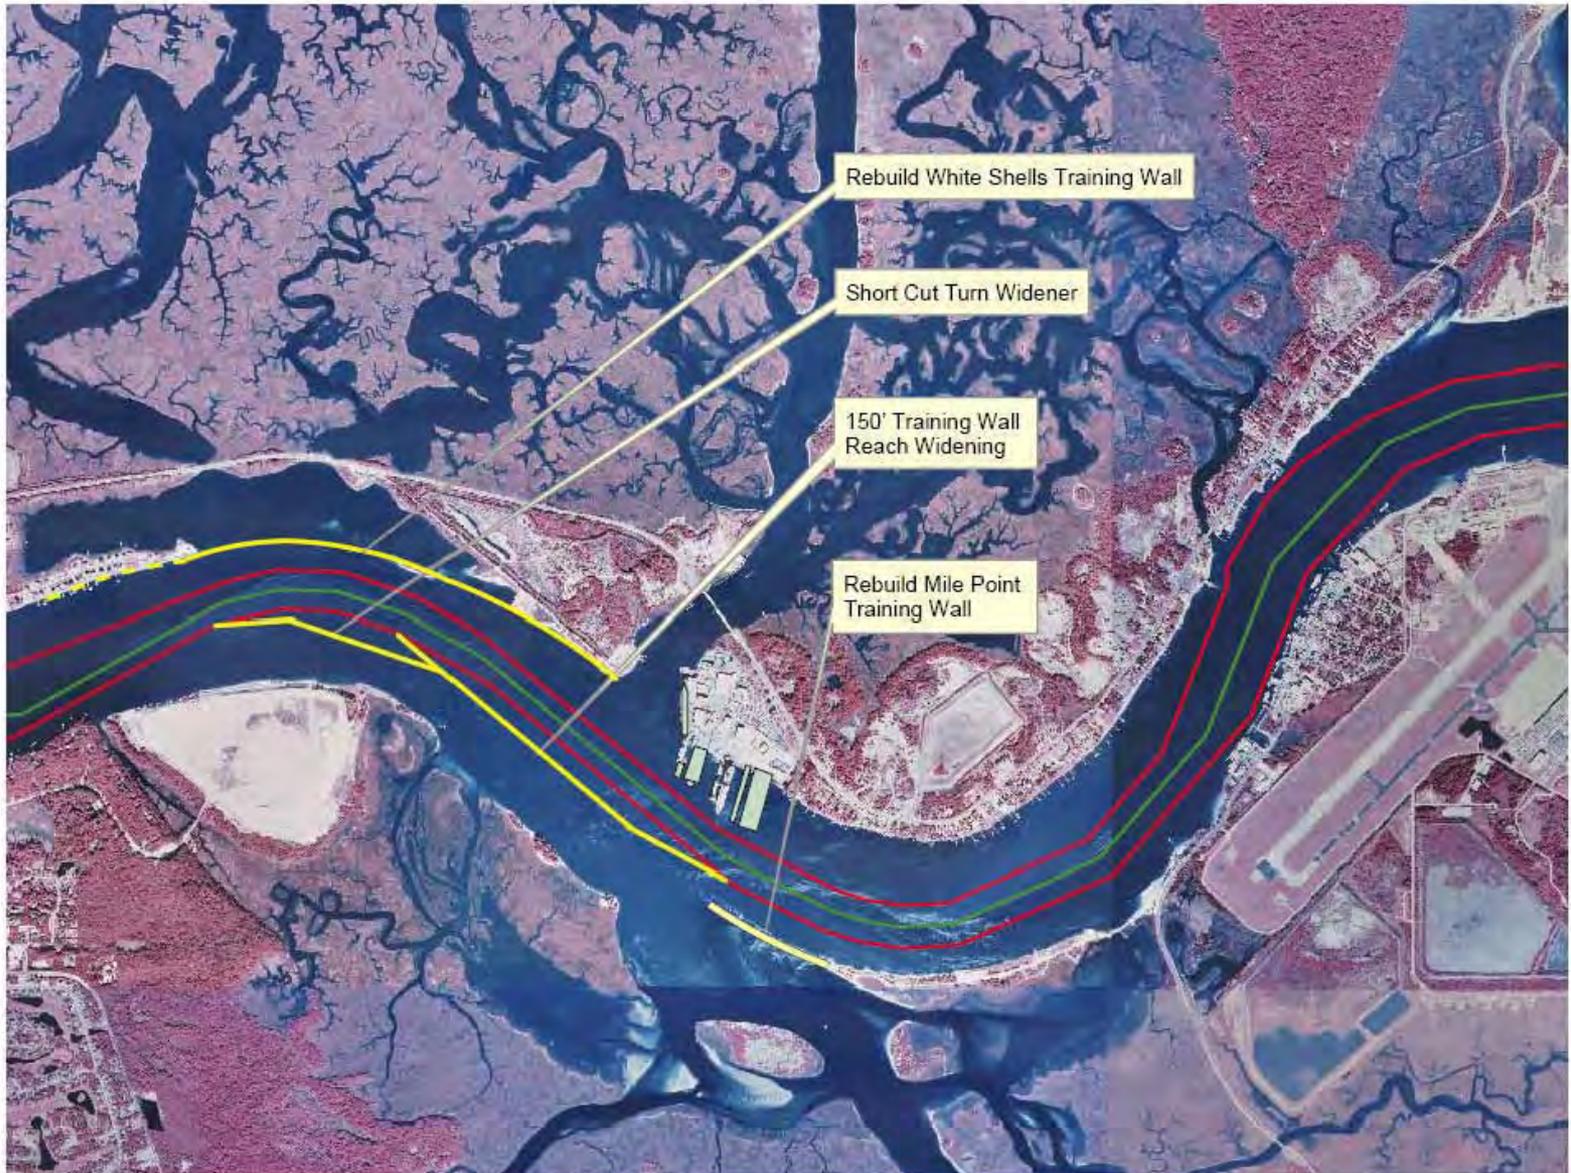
Proposed Alternatives: Rebuild White Shells Training Wall, Short Cut Turn Widener, 150' Training Wall Reach Widener, Rebuild Mile Point Training Wall
